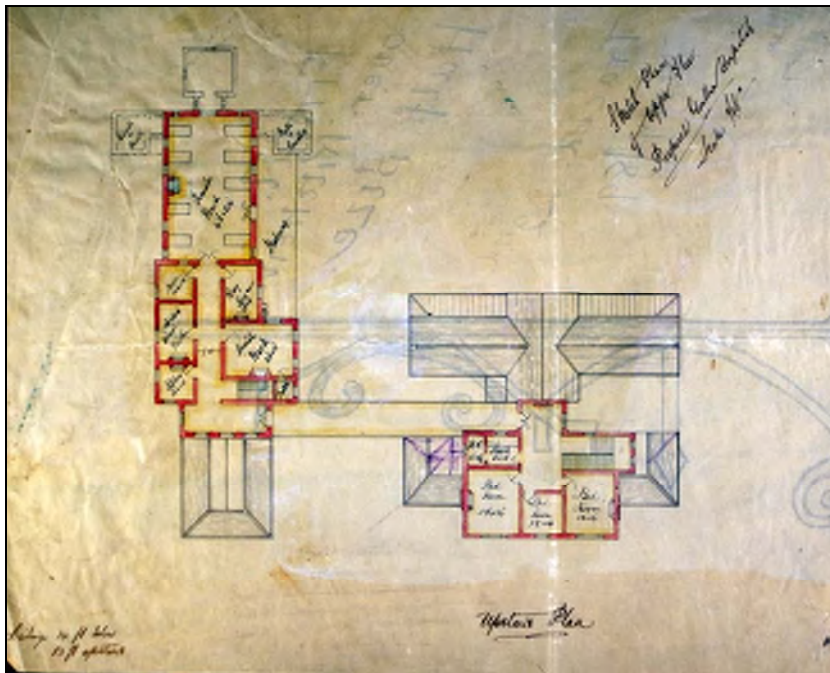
Undated, early first floor plan showing the basis of the Hospital plan with main two storey pavilion connected to the single storey kitchen wing at its rear and semi-detached two storey (eastern) pavilion.
